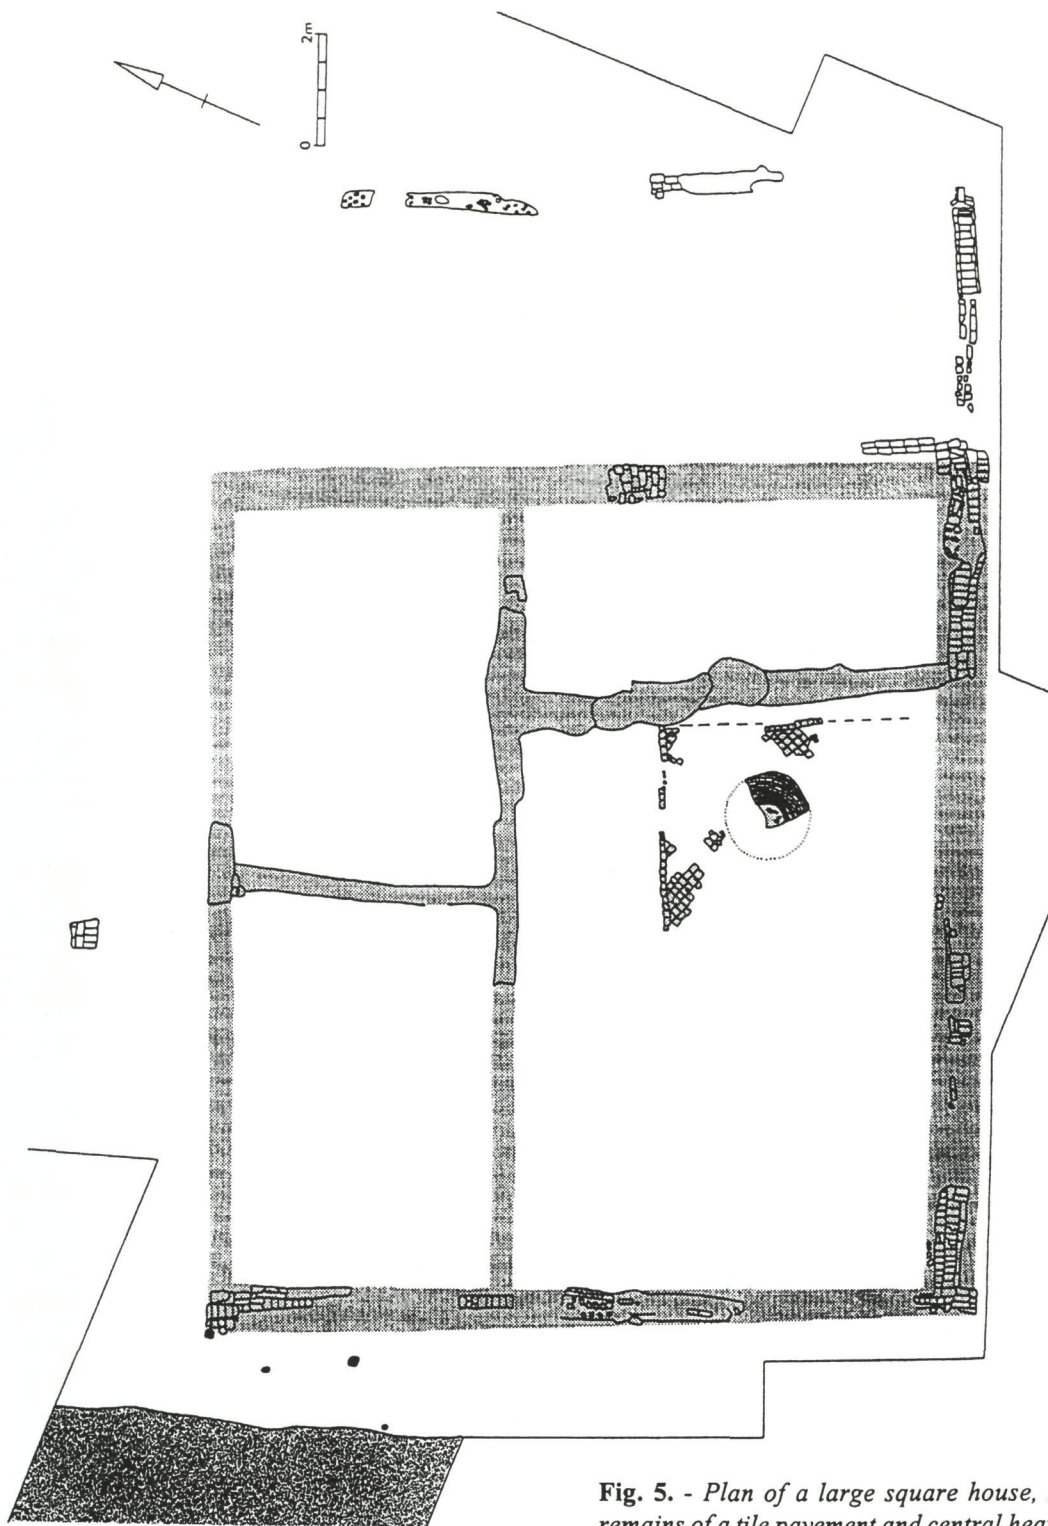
Plan of a large square house, showing in detail the remains of a tile pavement and central hearth (end 13th century).
